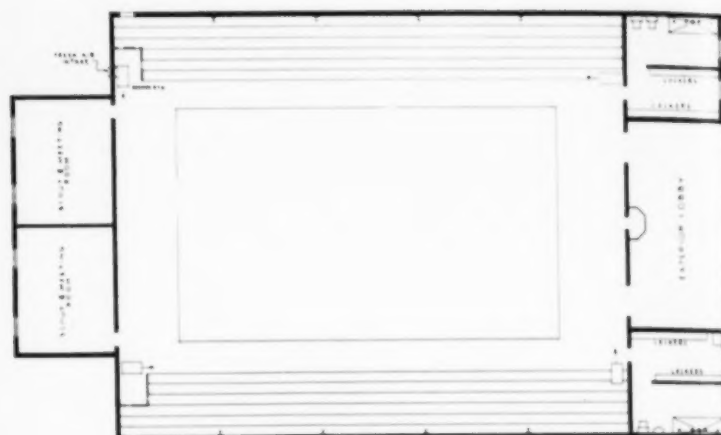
A. Floor Plan of school gymnasium shown in Fig. 4.
